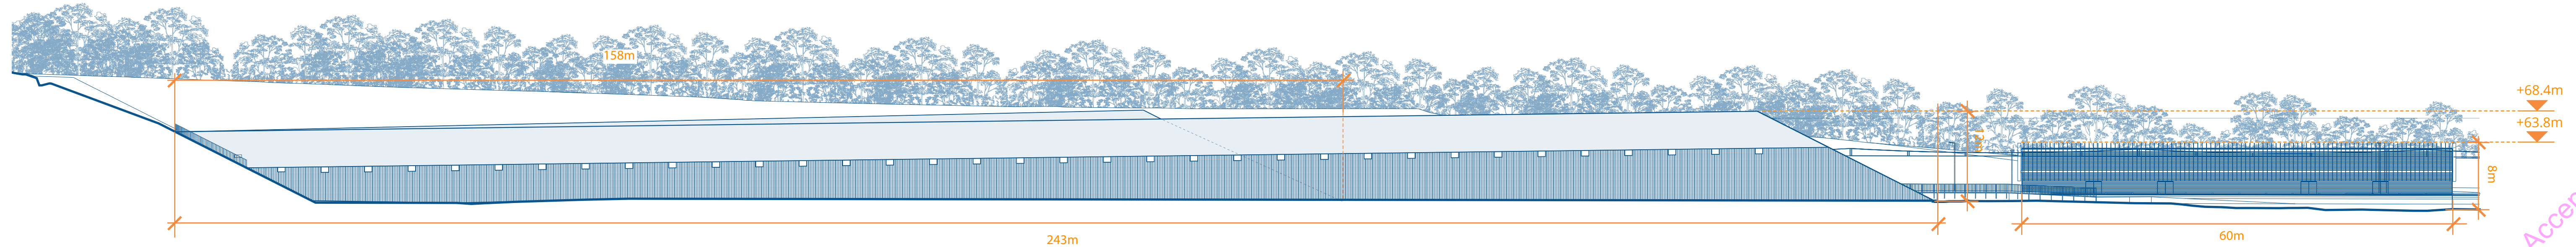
\_Proposed long south-west elevation - Key dimensions of portal structure and compound building
